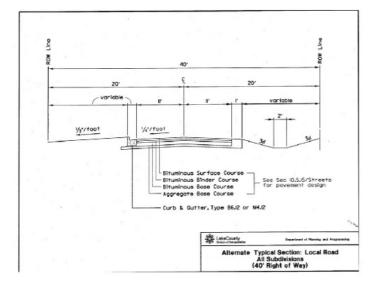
Alternate Typical Section: (40-foot right-of-way)
